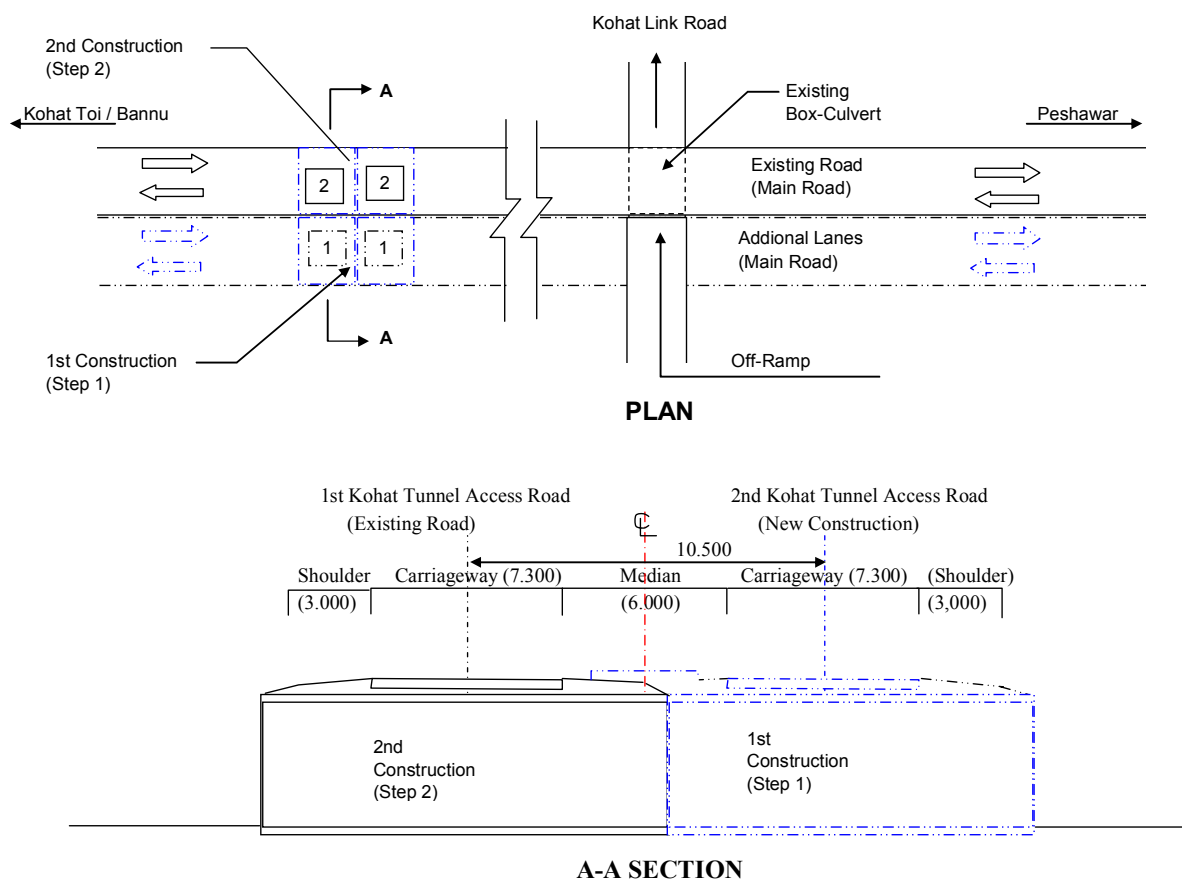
Construction Steps of Underpass (Box culvert) for Kohat Link IC
